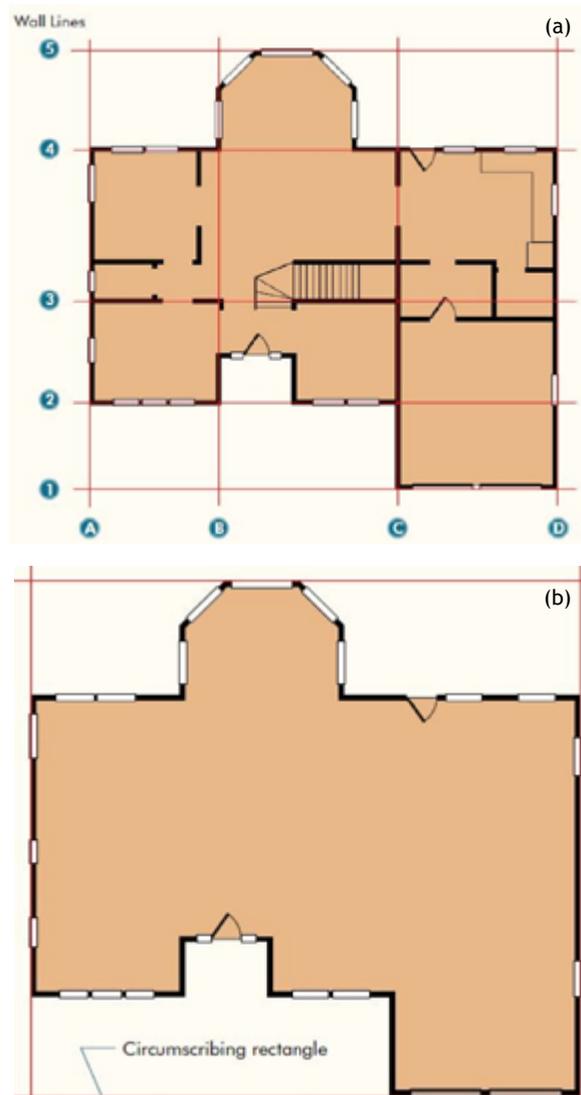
(a) Traditional wall bracing, (b) simplified wall bracing.
